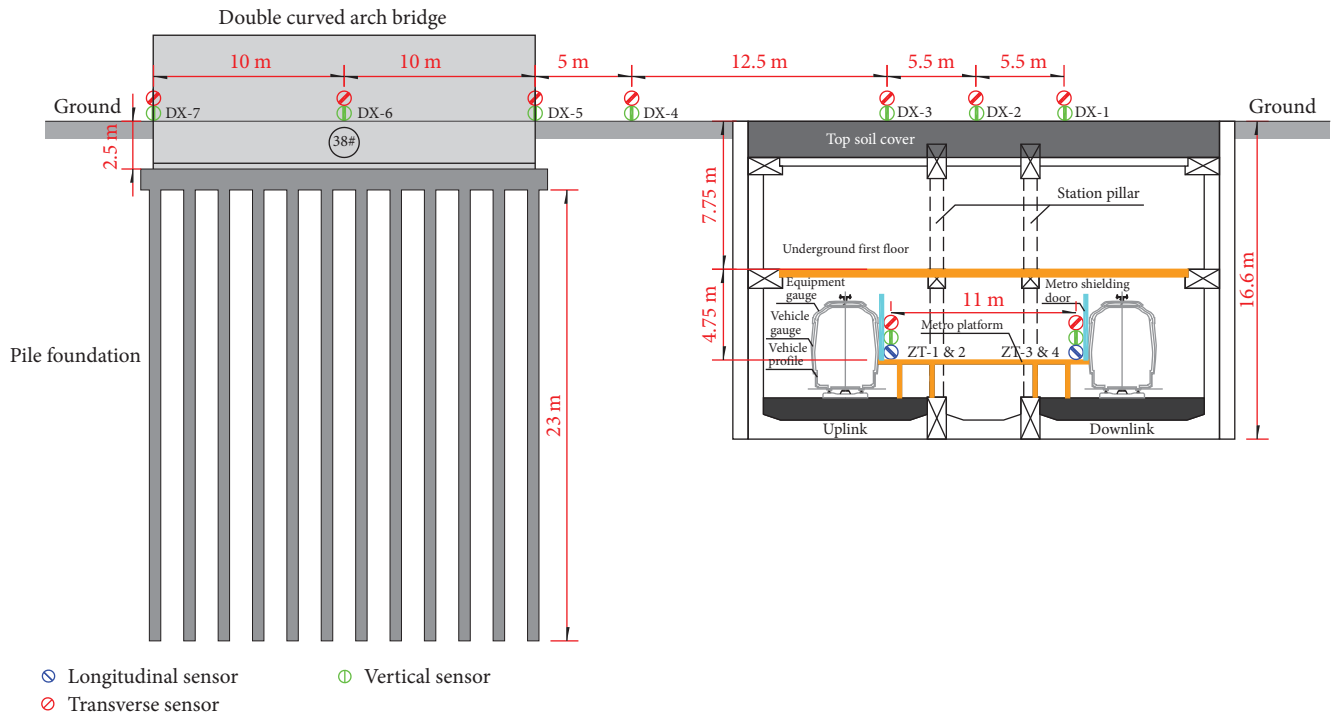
Relationship between subway and hyperbolic arch bridge elevation position.
